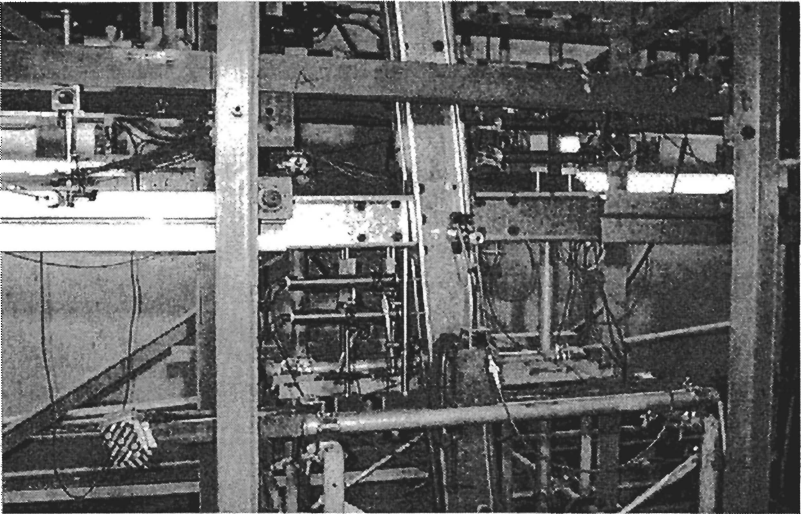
BFCsw Bearing failure in section web around bolt hole
